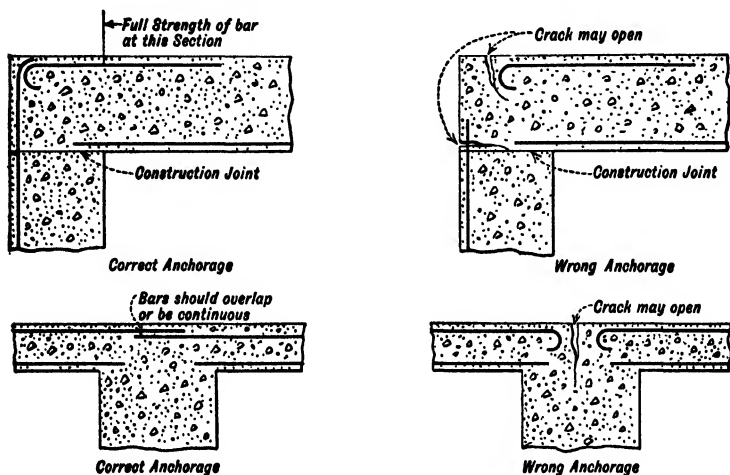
Method of Anchoring Bars. (See p. 266.)
